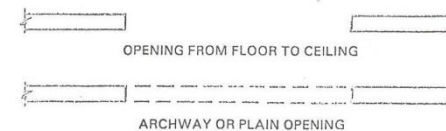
Method of representing interior wall openings, other than windows and doors.
